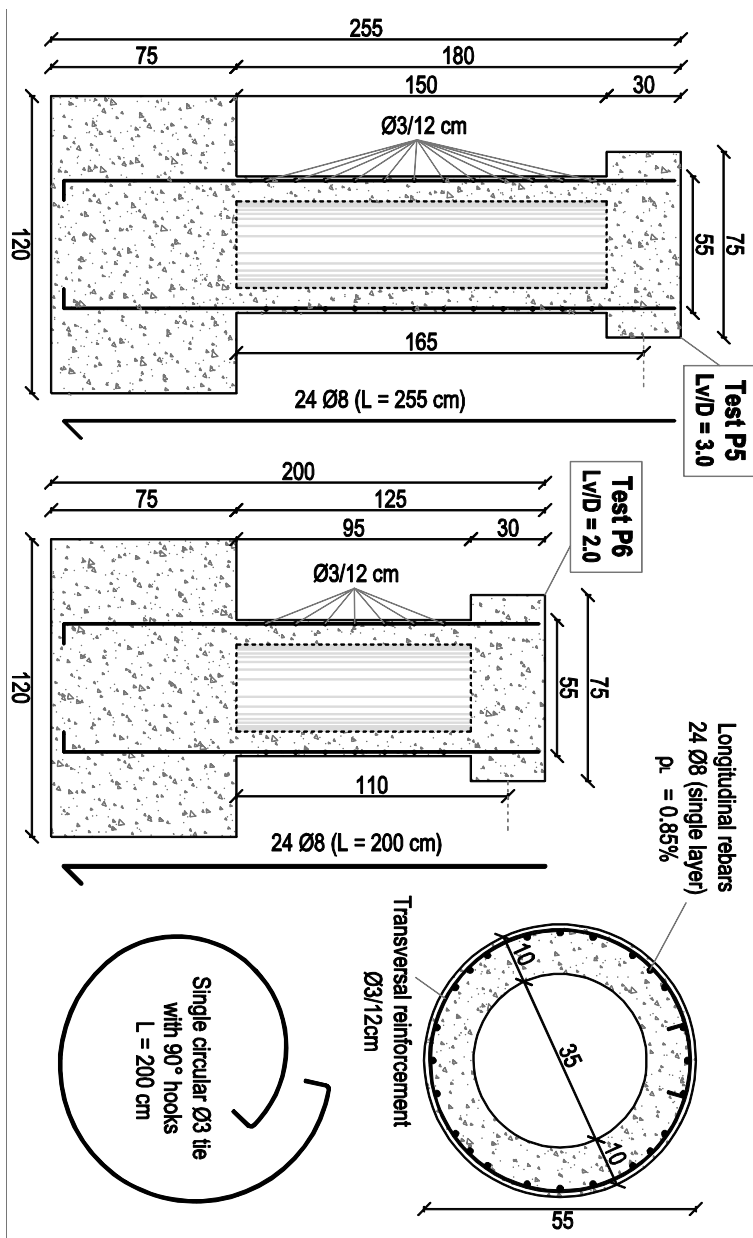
Geometry and reinforcement details (hollow circular specimens)
